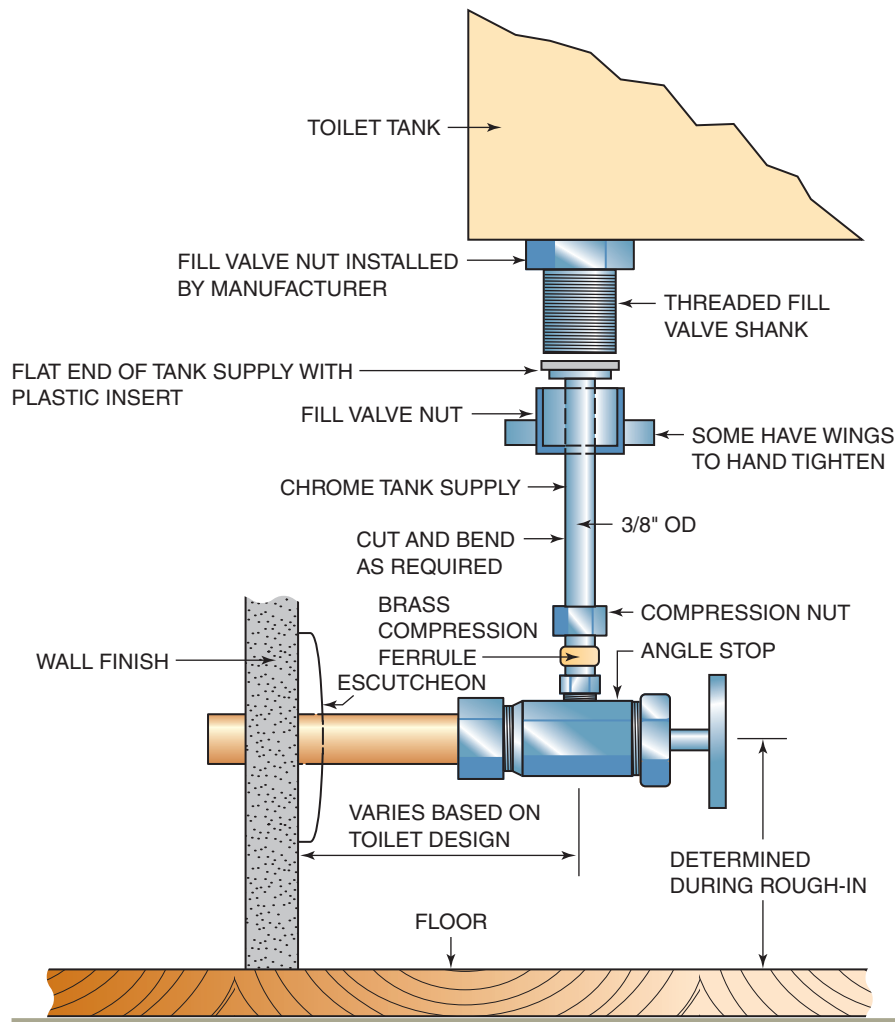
A toilet tank supply tube connects the stop to the fill valve of a toilet tank.
